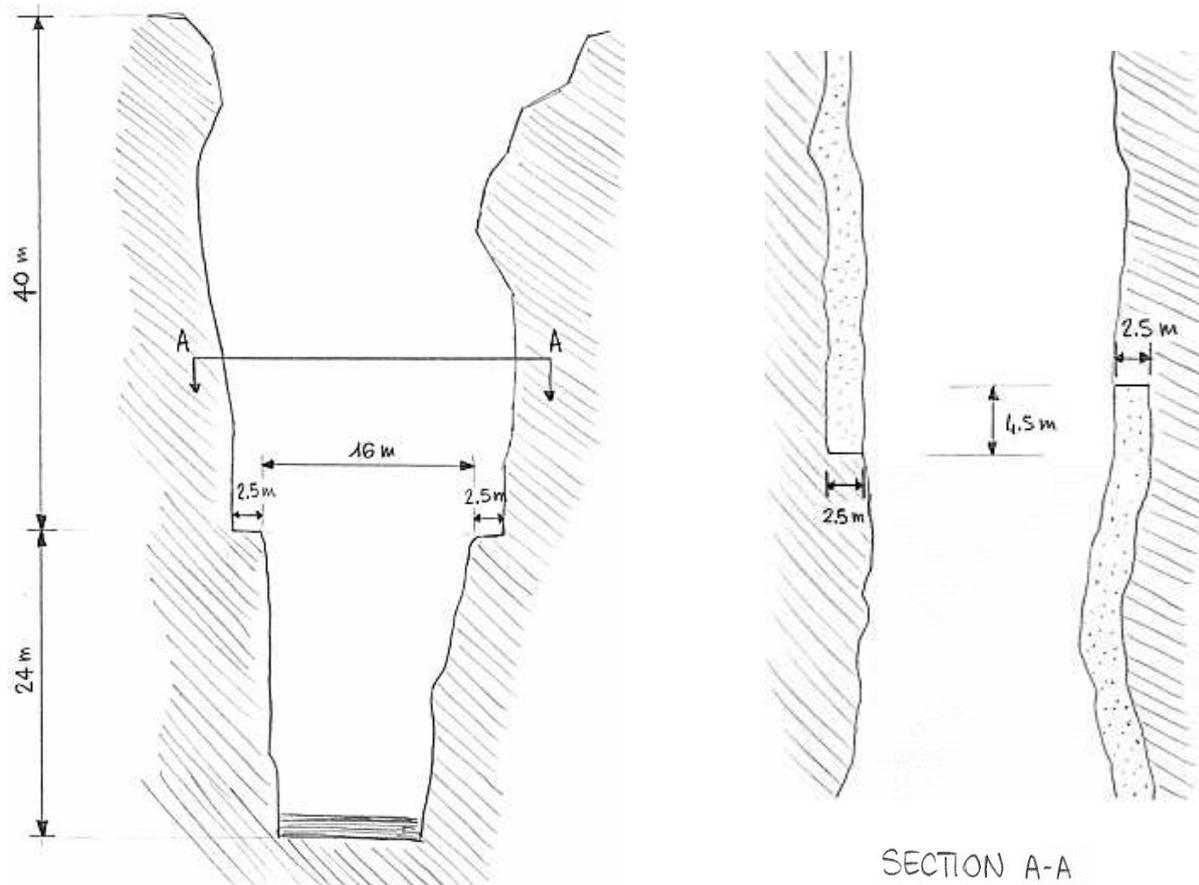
Cross section (left) and plan view (right) of the canyon at the location of the future crossing.
